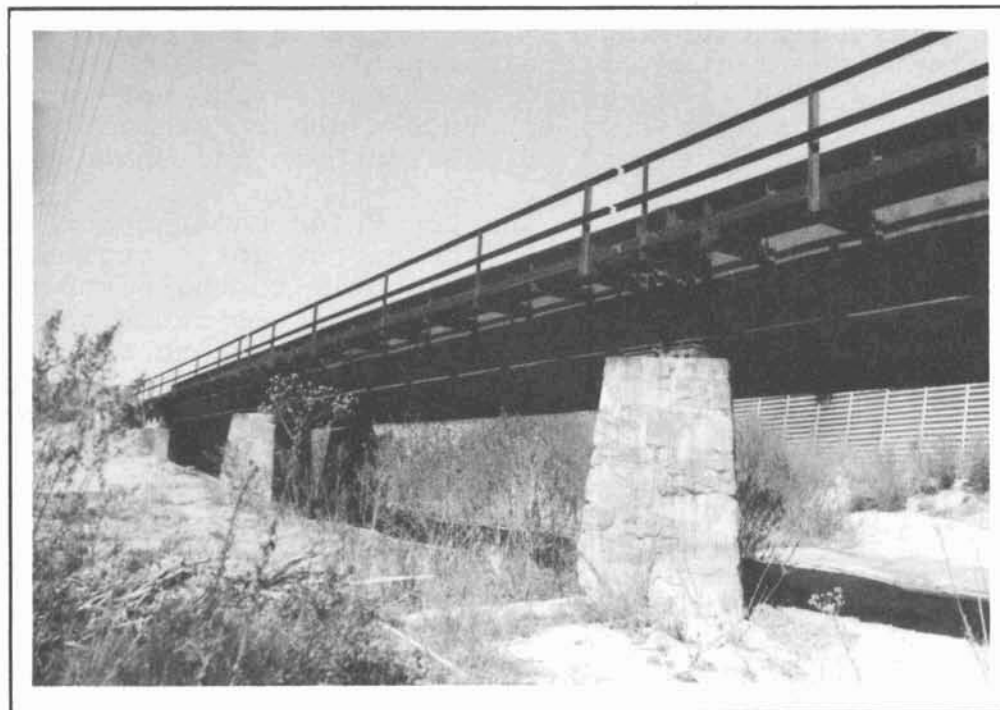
Rubble Pier Railroad Bridge in Cajon Creek Near Cajon Junction
